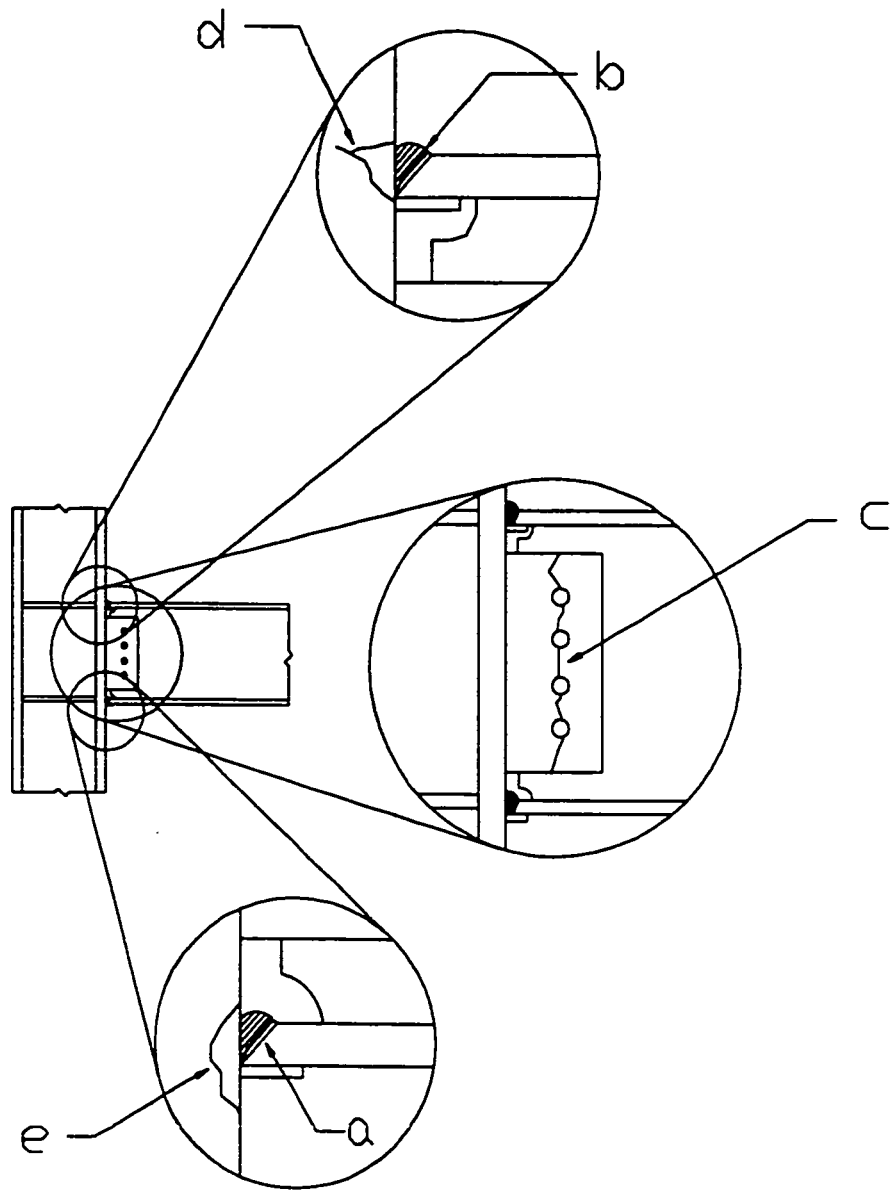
Common BWRF connection failures: (a) frame girder bottom flange weld, (b) frame girder top flange weld, (c) cracks in shear tab, (d) cracks in frame column, and (e) divots of steel removed from column flange.
